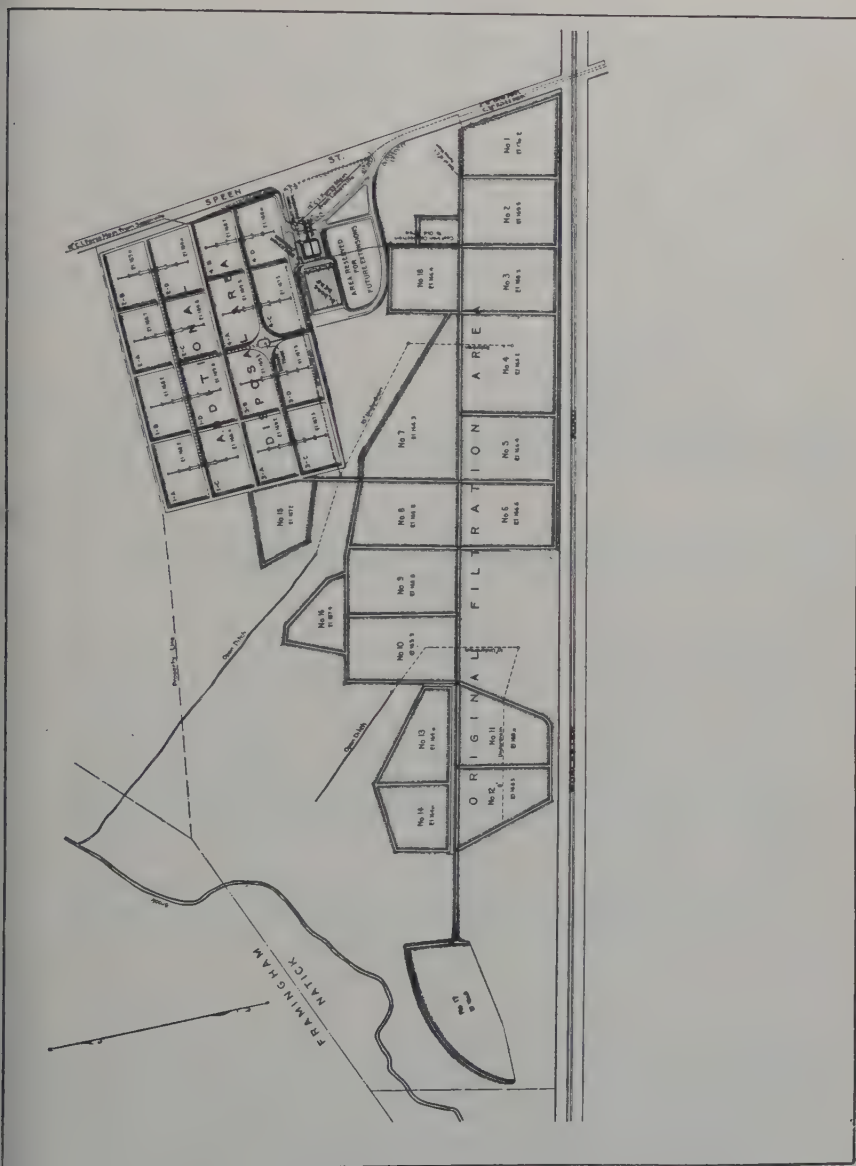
GENERAL PLAN OF DISPOSAL PLANT
